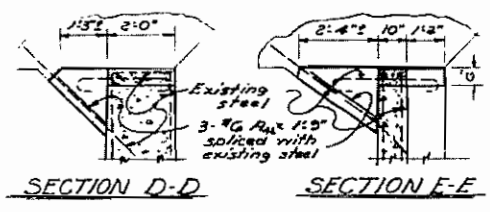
DETAILS ARCH ABUTMENT NO.1 SHOWING PORTIONS TO BE REMOVED
